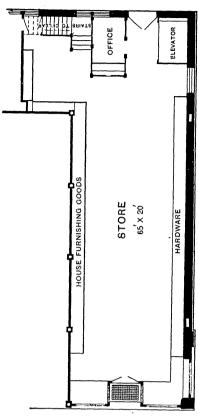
First Floor Plan, S. H. Berry Hardware Co.
